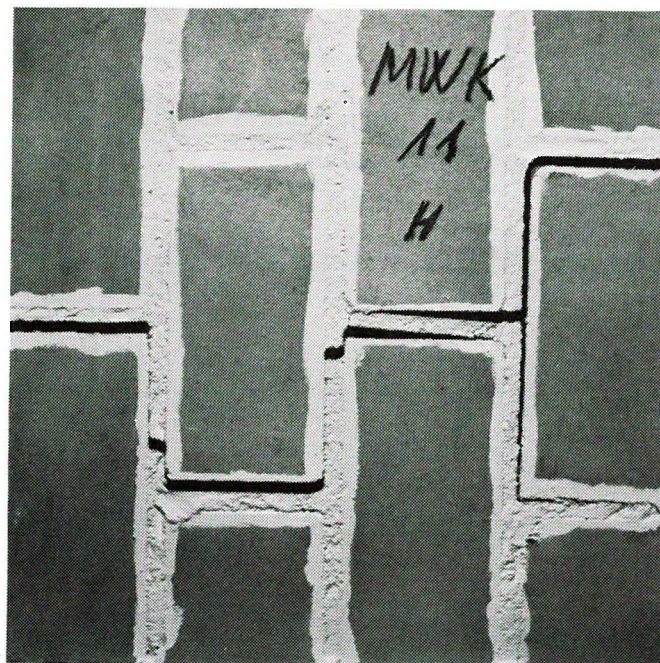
Failure Mode of a Wallette made of KS 12 and Mortar MG III
